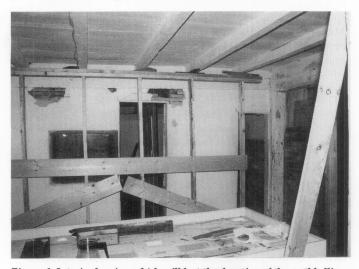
Interior bracing which will last the duration of the mothballing will protect weakened structural members. Jethro Coffin House. Photo: John Milner Architects.
